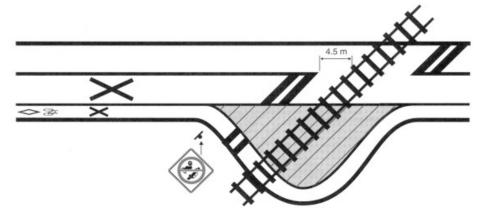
Skewed Railroad Crossing Restricted Right-of-Way Width with Gate Control
